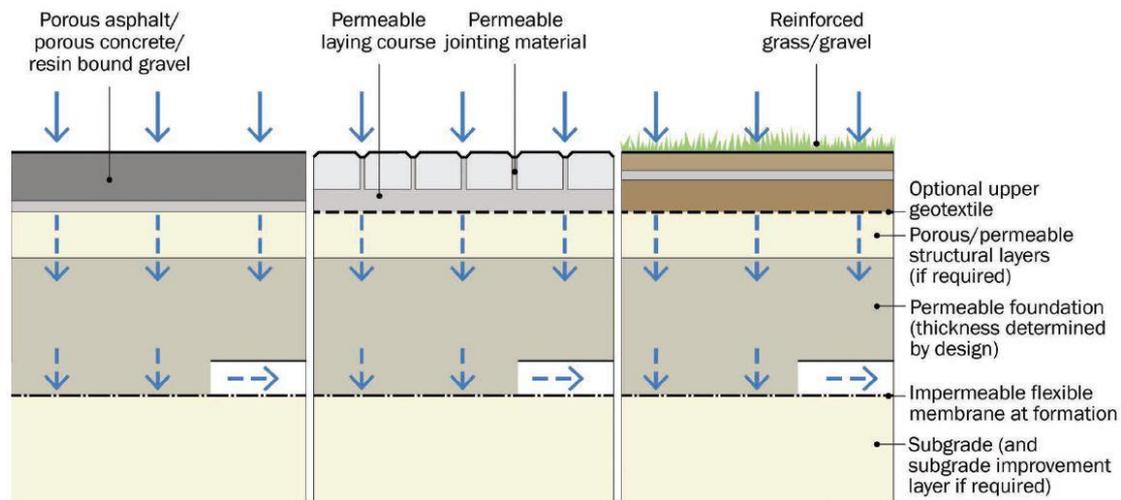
Schematic drawing of pervious pavements equipped with underdrains (Woods-Ballard et al., 2015a).
